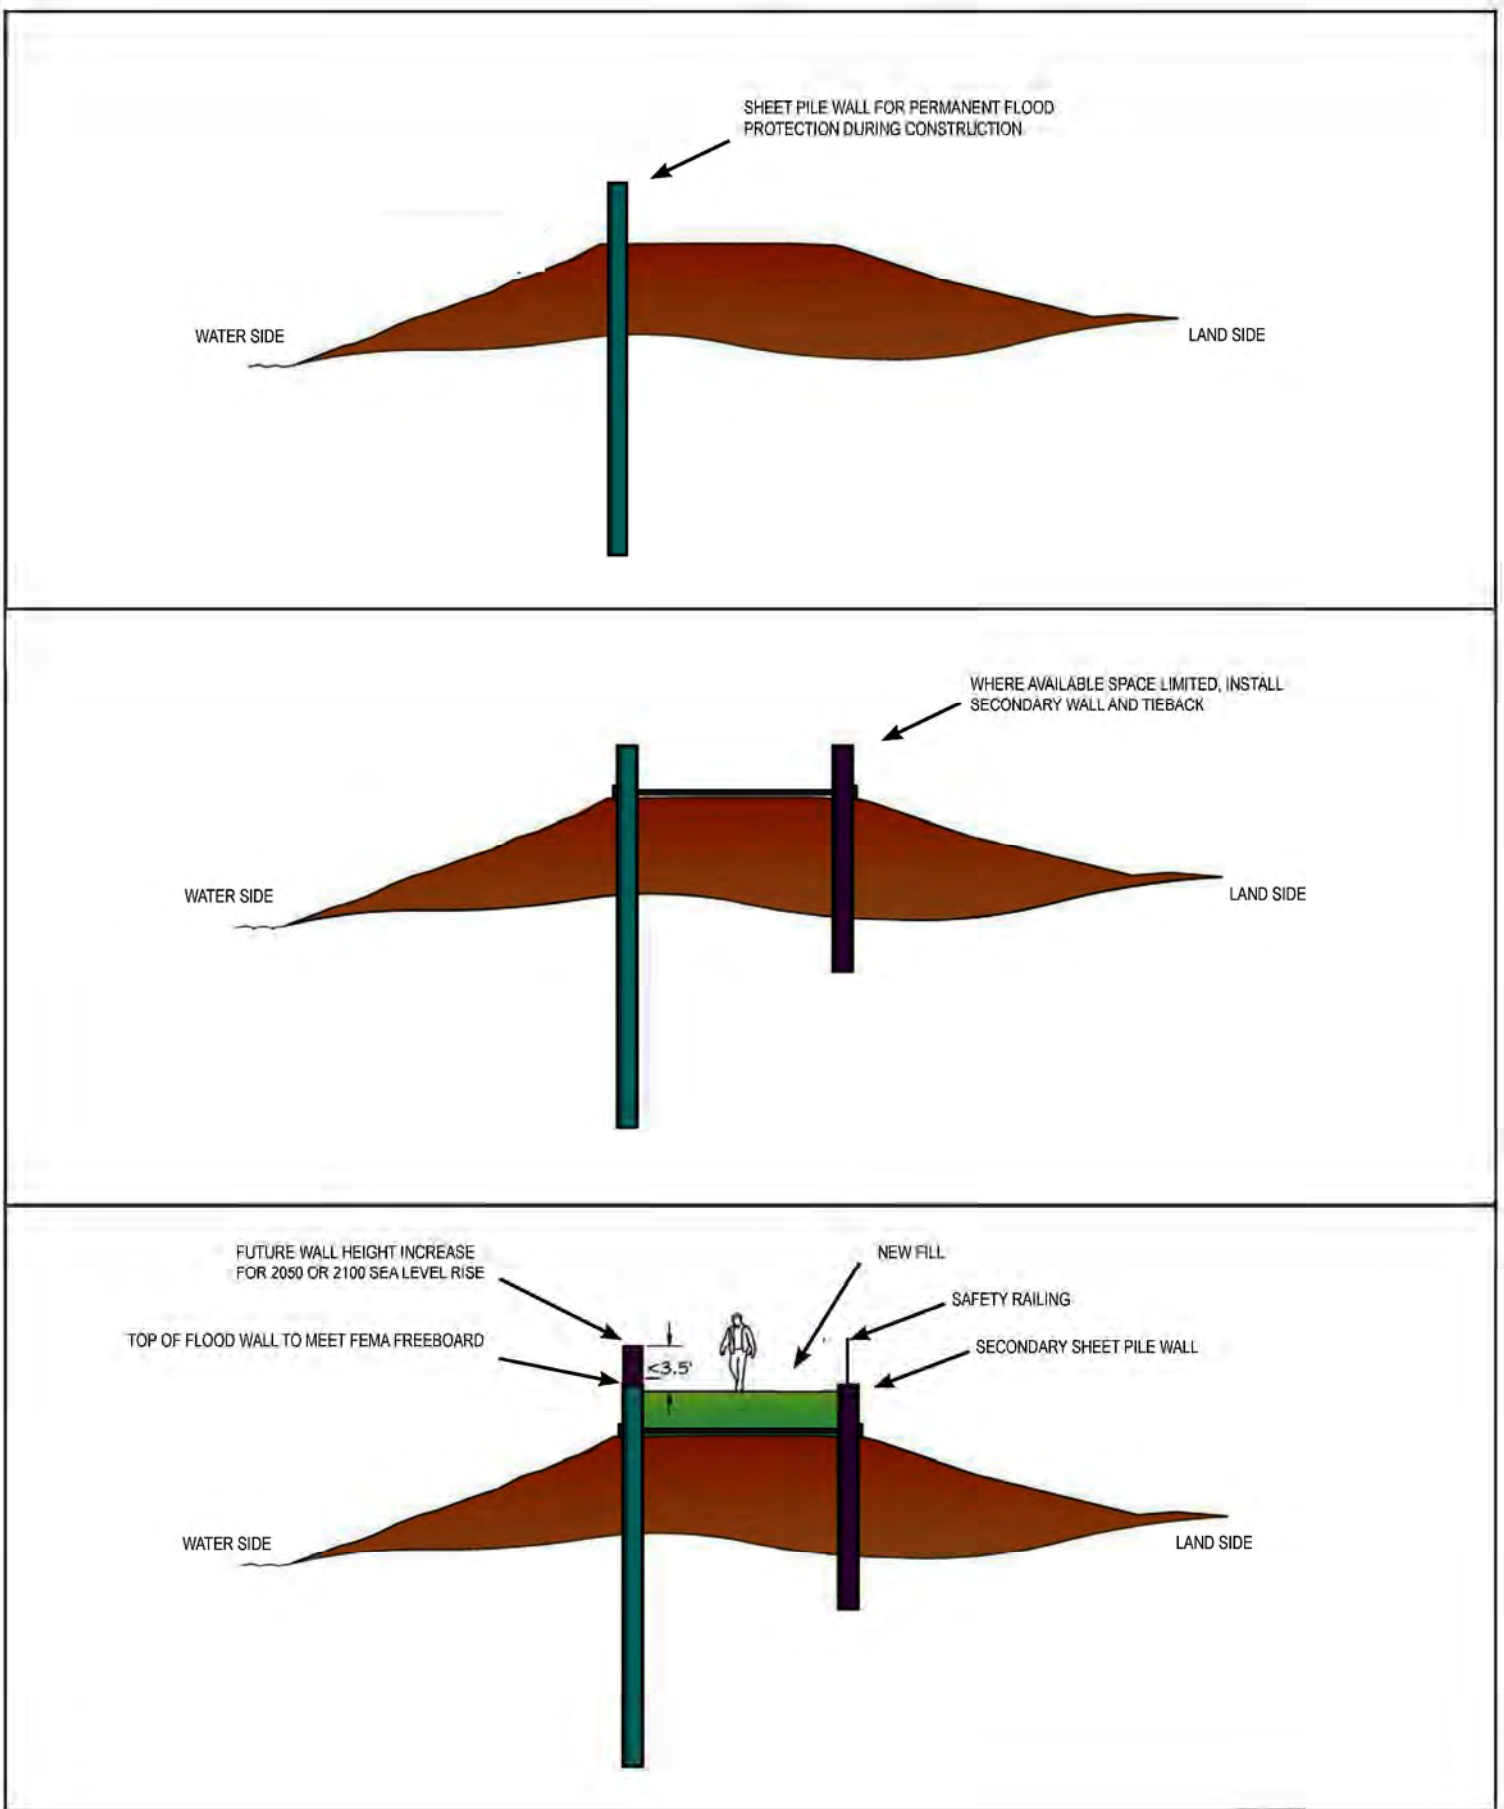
Typical Double Sheet Pile Floodwall Improvement
